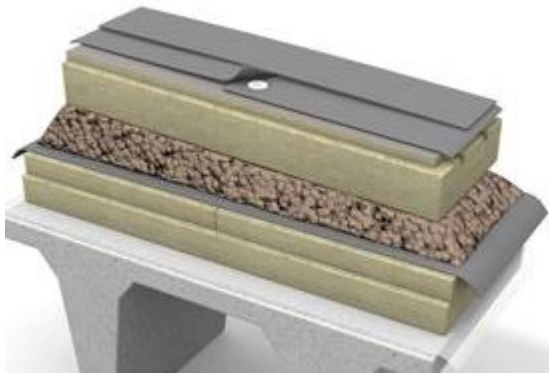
Example of additional thermal insulation on flat roof /2/
